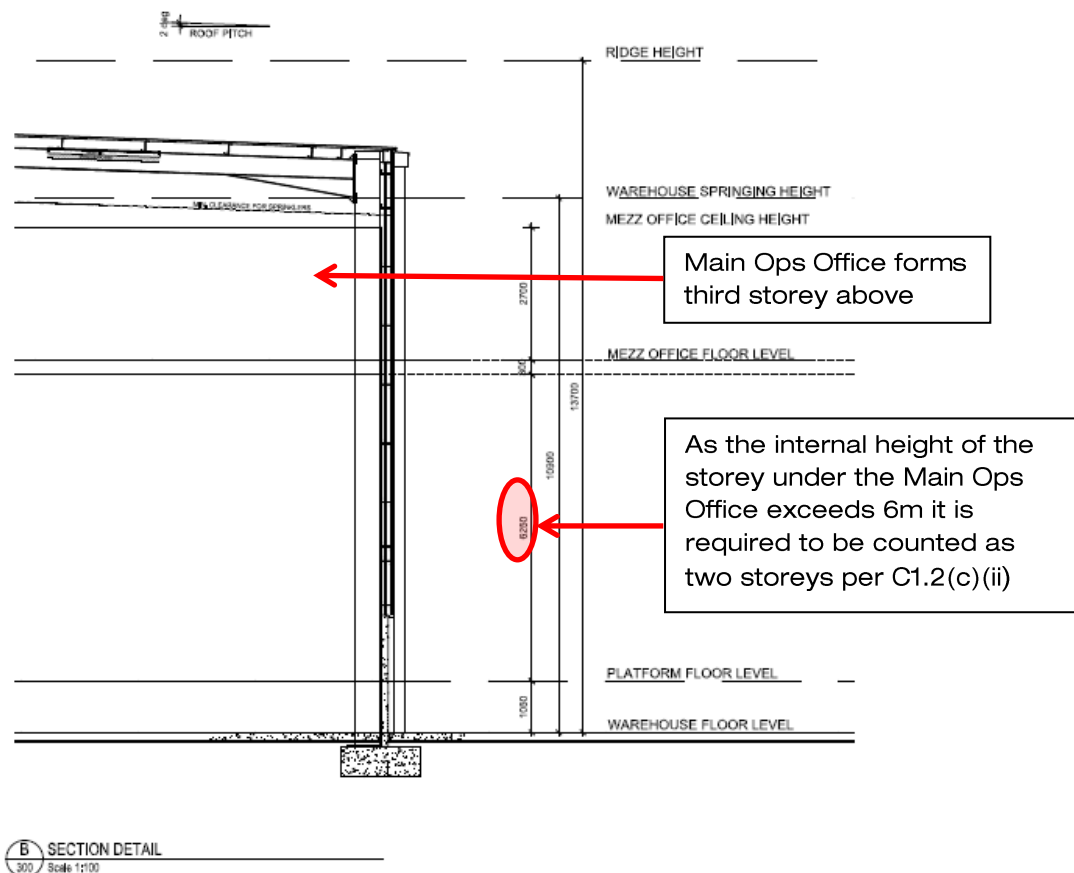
Rise in Storeys of Warehouse Building – C1.2(c) issue.
